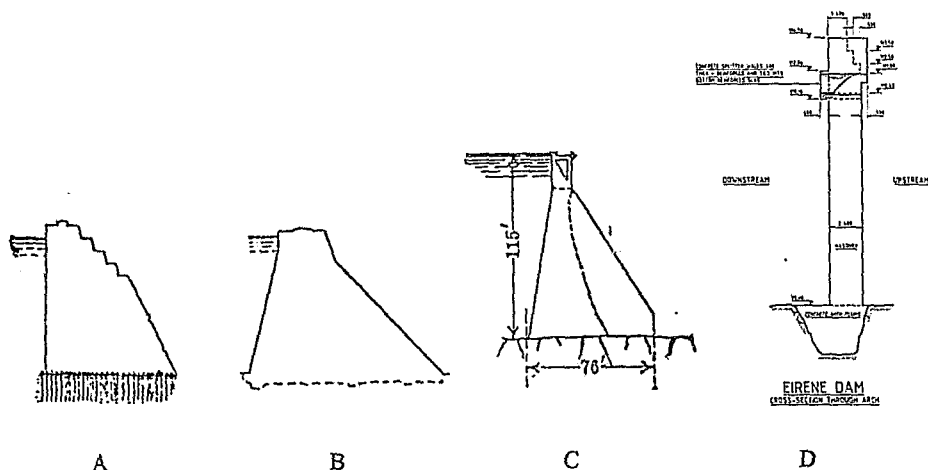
Profiles of typical RMC arch dams built over a century ago compared to a typical modern RMC structure. A. Puentes Dam, Spain, 1791, held water for ten years. In 1802 its pile foundation washed out and 608 lives were lost. B. Gillepe Dam, Belgium 1875. C. Sweetwater Dam California 1888. D. Eirene Dam, Zimbabwe 1987.
